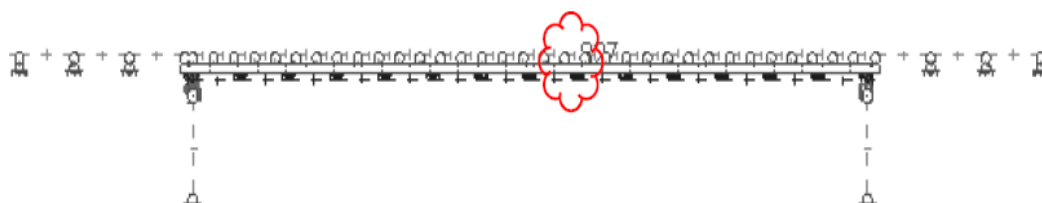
Longitudinal Cross-section of Model for 24.5 m Span Length
